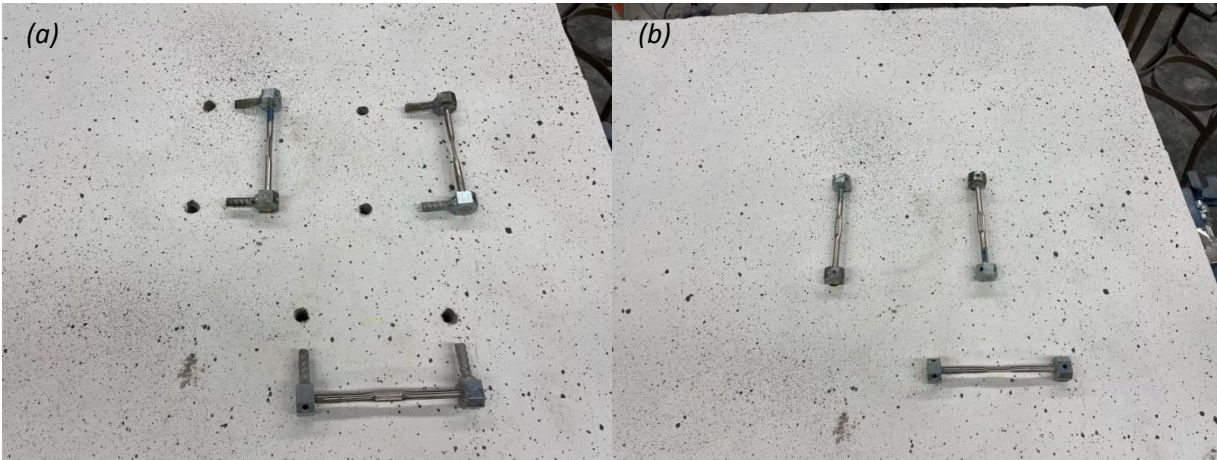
a) Strain gauges with mounting blocks ready for epoxy and b) installed strain gauges
